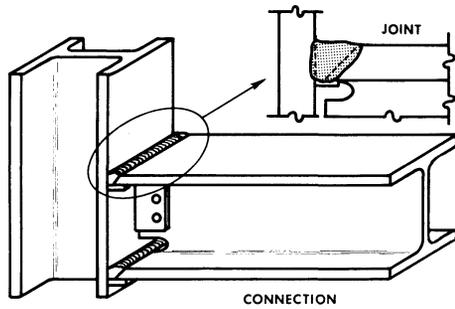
Typical moment connection with full penetration welded flange joint
